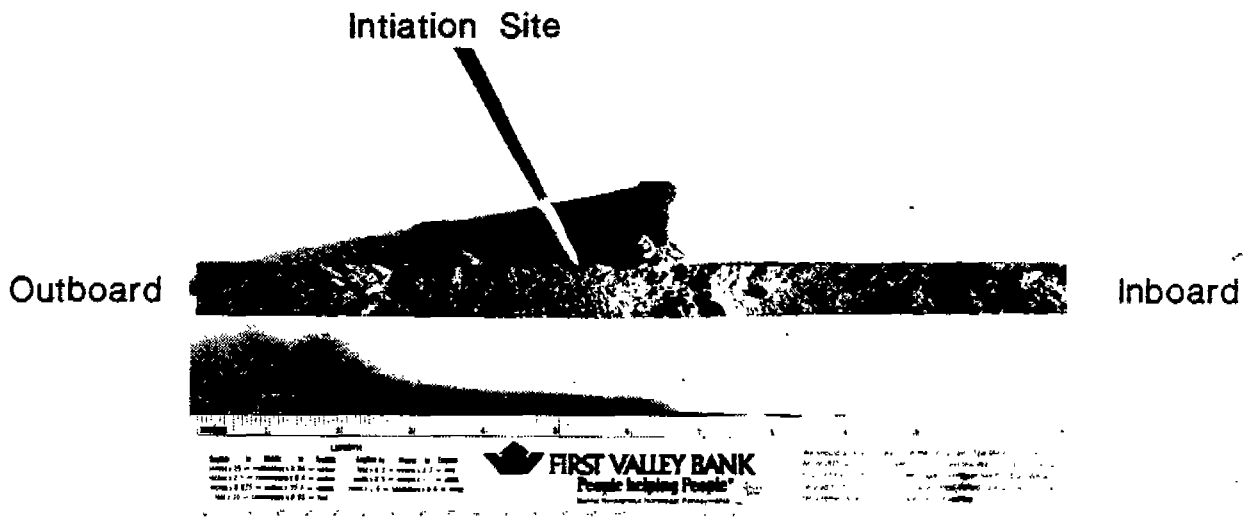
Piece no. 6. Fracture initiation site in deck at channel butt weld.
